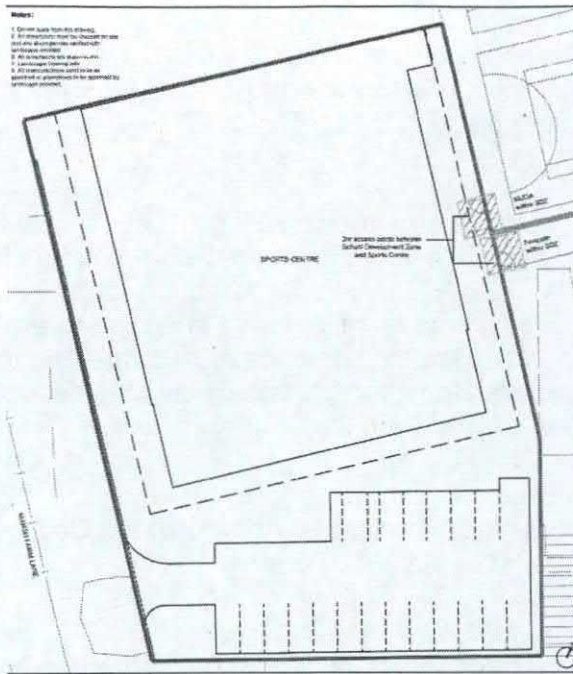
Extract from Drawing LD PLN 033A showing access points between the College and School Development Zones
